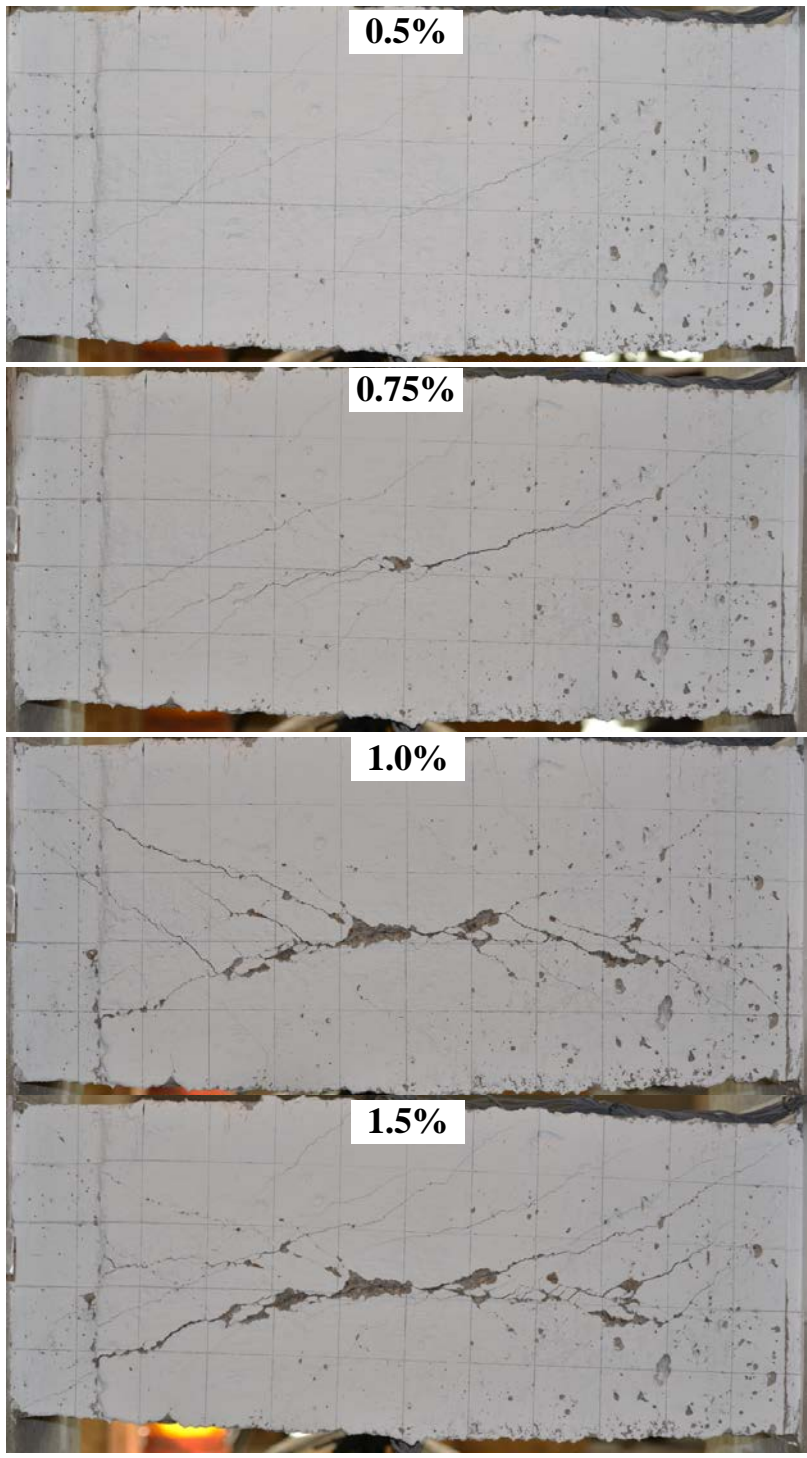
Crack and damage pattern of R2.4-SC-2-W (1)
